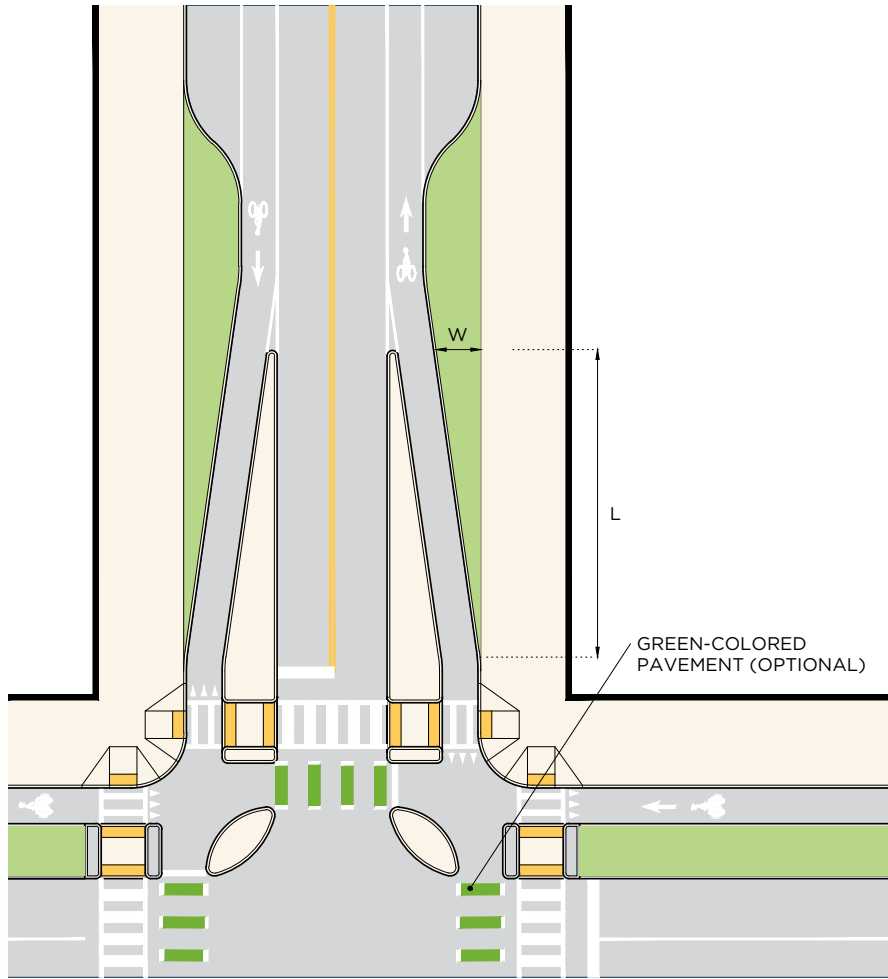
Striped Bike Lane To Separated Bike Lane On Intersecting Street
